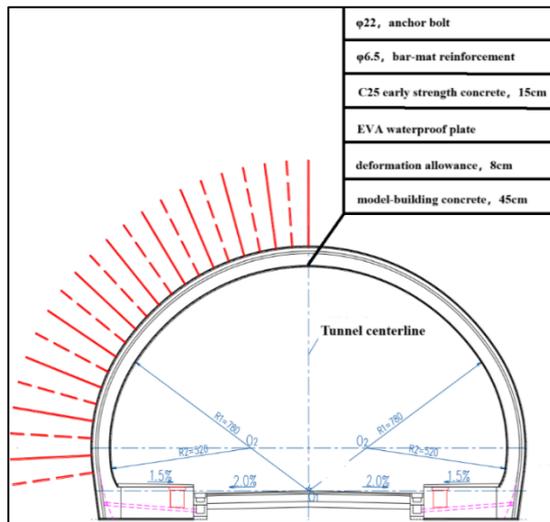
Class III Surrounding Rock Tunnel Support Diagram
